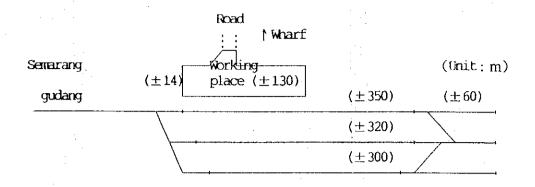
Tg. Emas Port Container Terminal Track Layout Sketch
